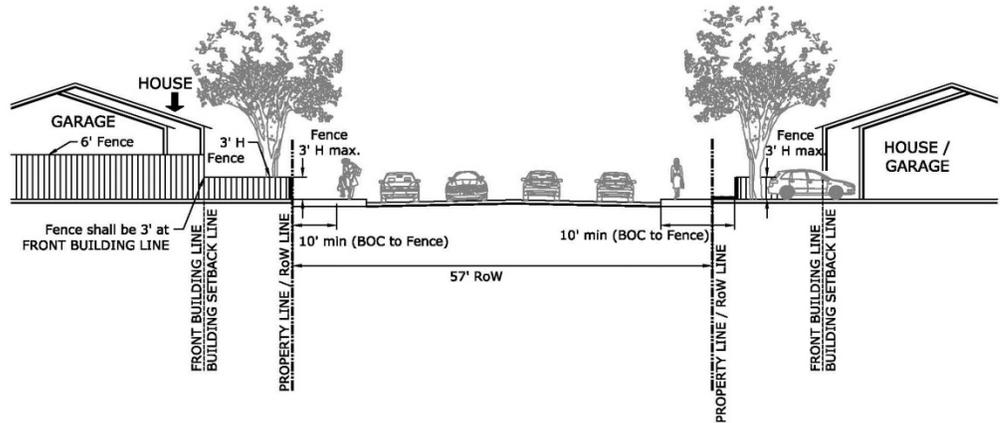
(d) – Typical Cross Section with NO Landscaped Area and Sidewalk
